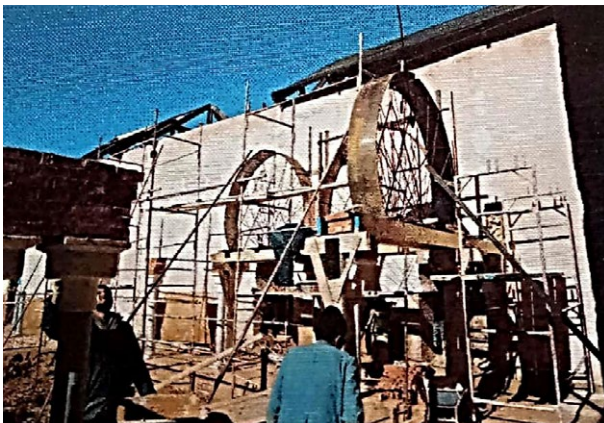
Construction of arches and walls along the arcades. (Source: Technical Design Office A.R.C.A.D.E. 2011).
